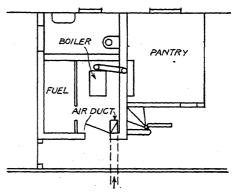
Boiler house at a country house The house is at ground level, allowing fuel and ashes to be handled by wheelbarrow. Existing chimney flue is utilised and an air duct provides the necessary entrance of air from outside.
